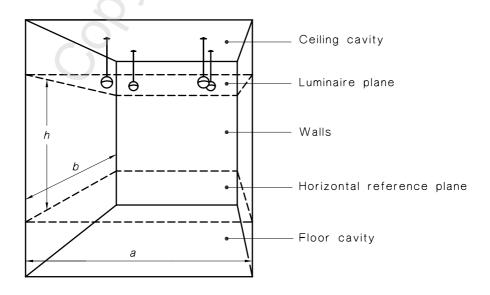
FLOOR CAVITY, WALLS AND CEILING CAVITY
